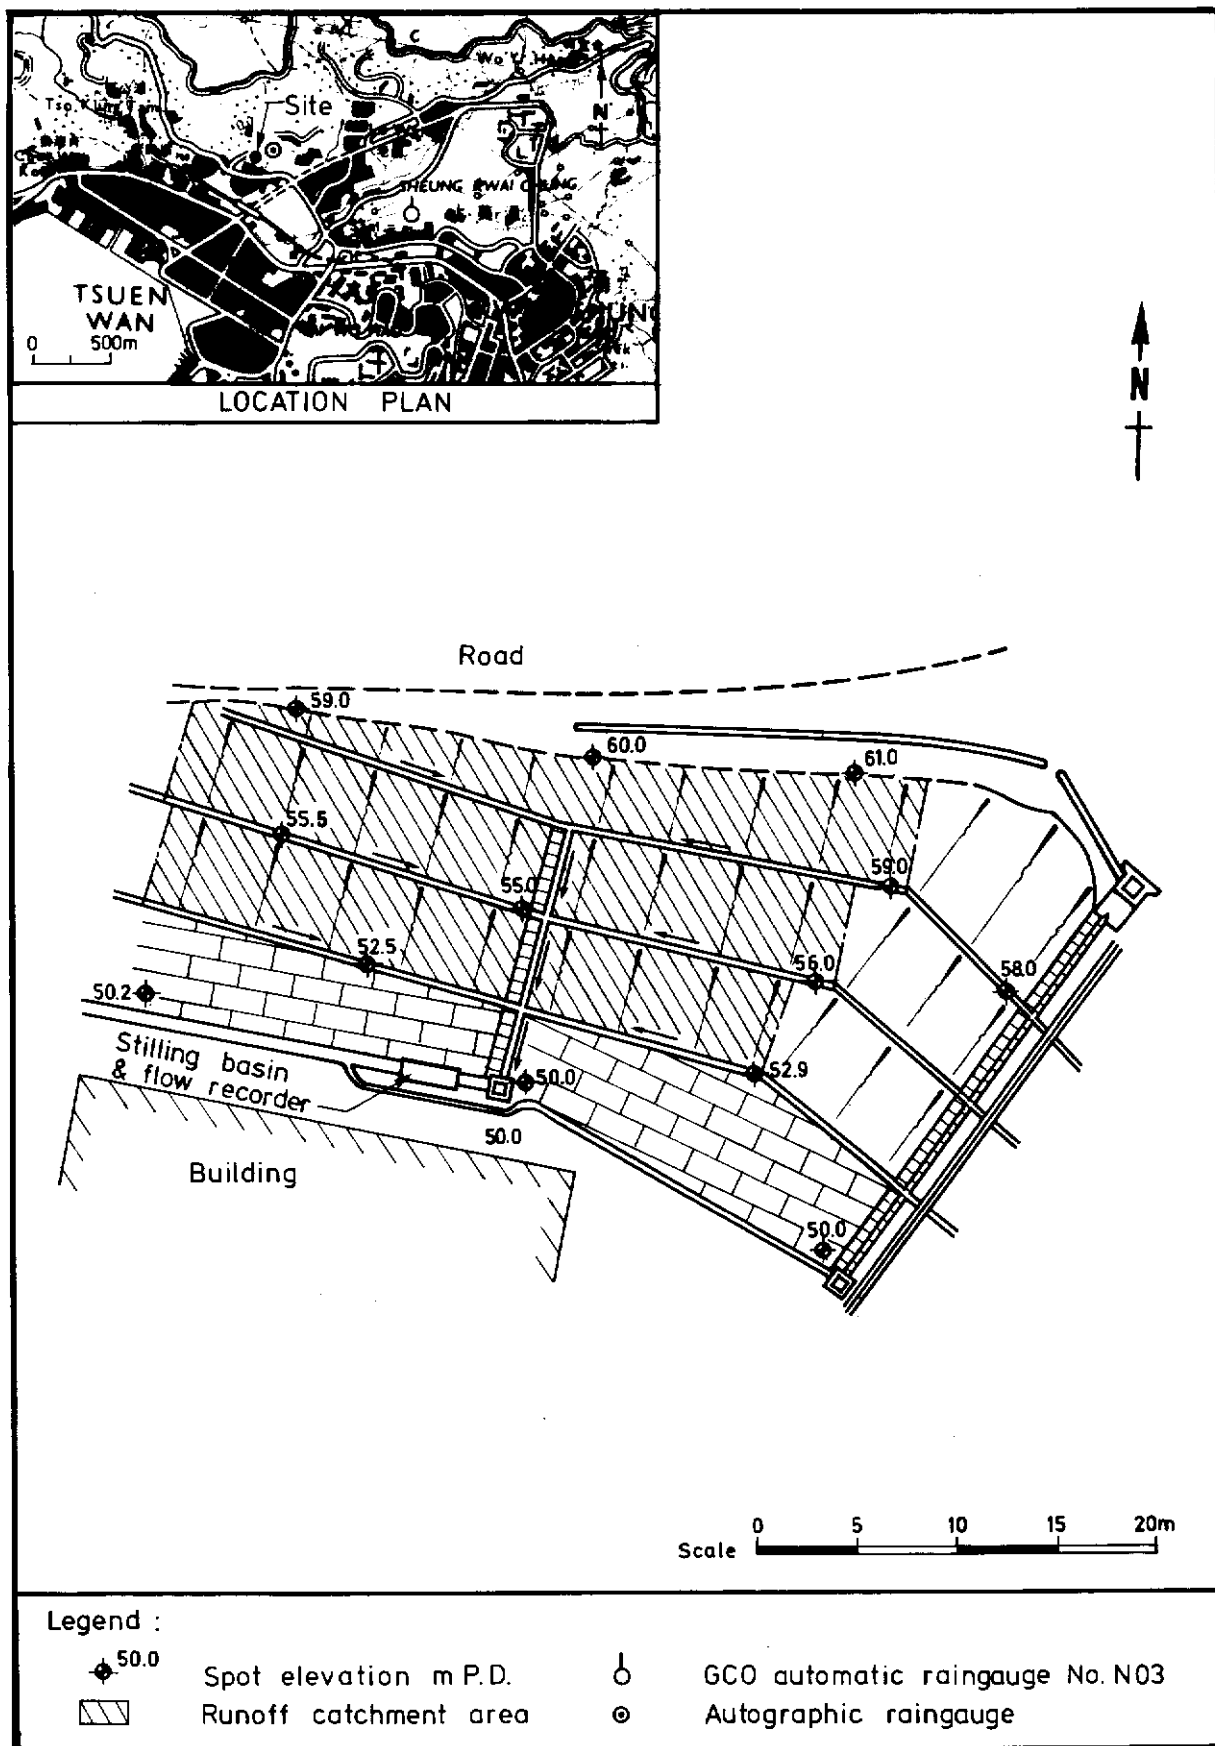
Site Plan for the Runoff Plot at Tsuen Wan (TWA)
